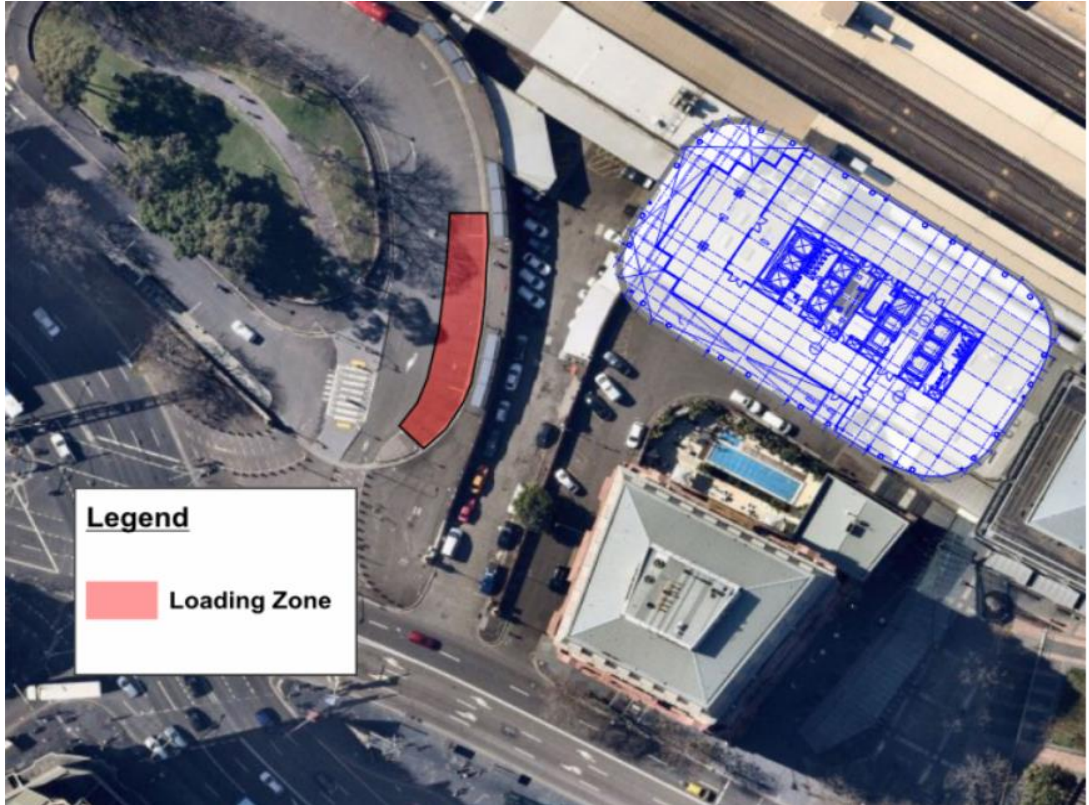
Indicative Loading Zone Layout Plan – Railway Colonnade Drive
